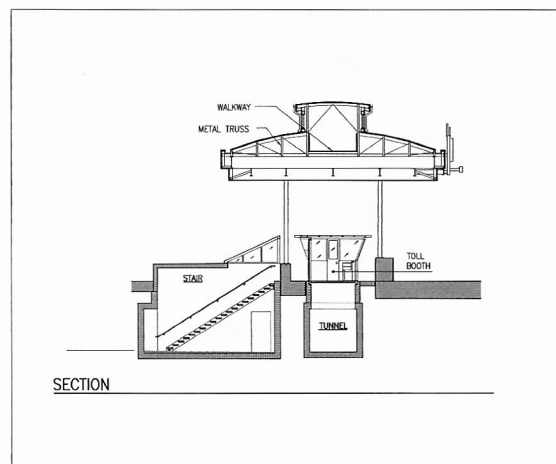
Toll collectors will access the plaza via a new 108-foot, pre-cast concrete pedestrian tunnel, which will provide a safe, secure, and weather-protected passageway.
